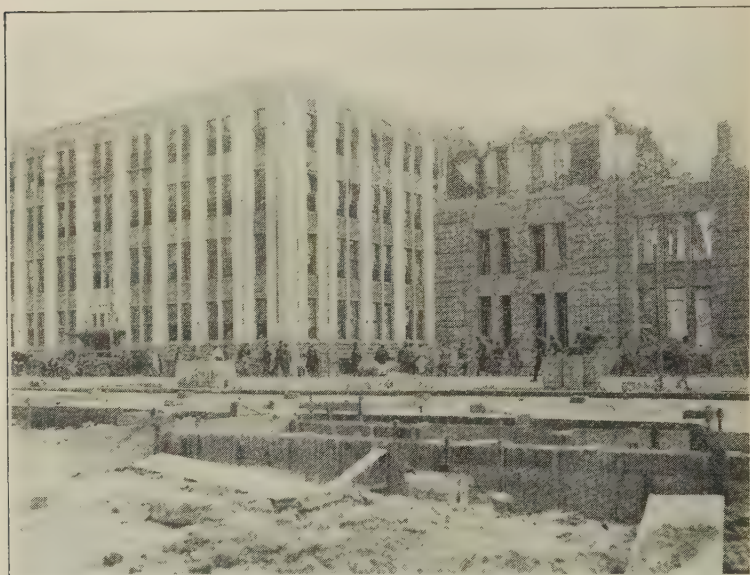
ABSOLUTELY UNDAMAGED REINFORCED-CONCRETE BUILDING ON BLOCK IS MARUNOUCHI CENTRAL, TOKIO.
